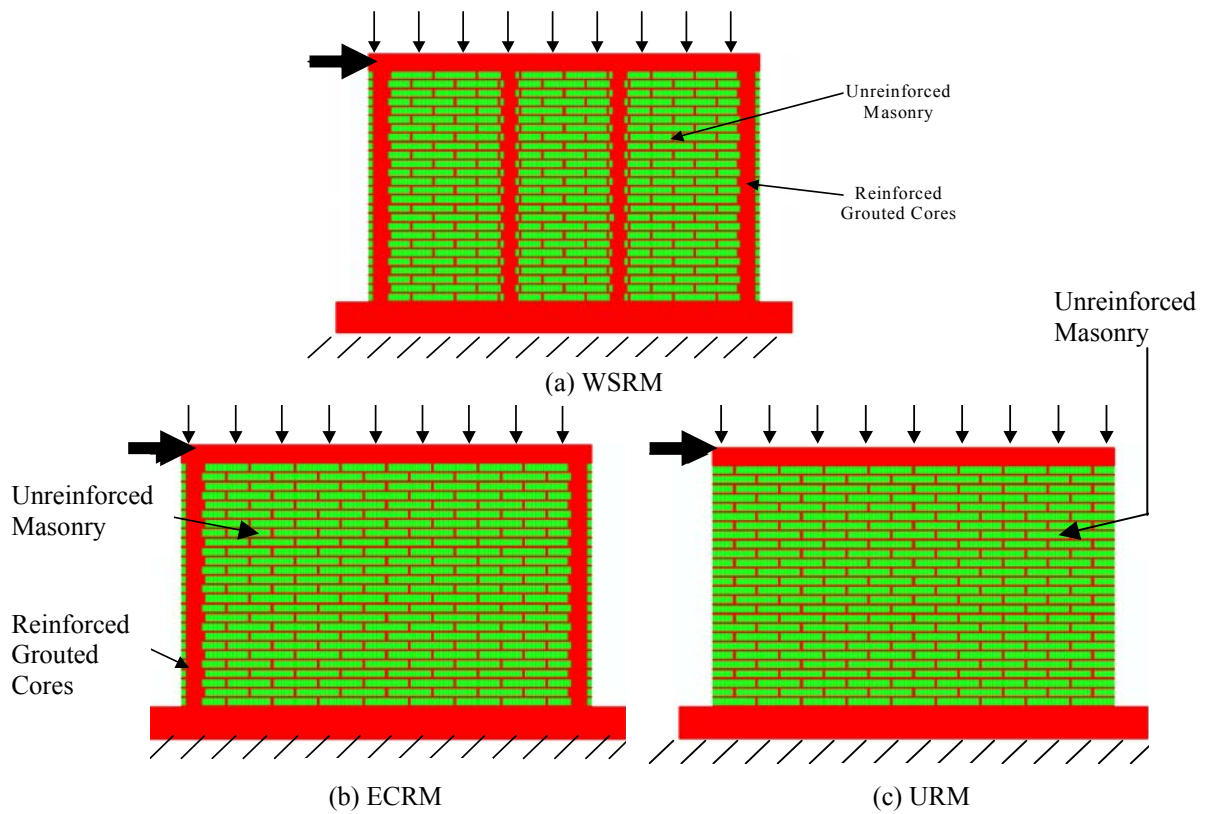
Geometry of WSRM, ECRM and URM walls
